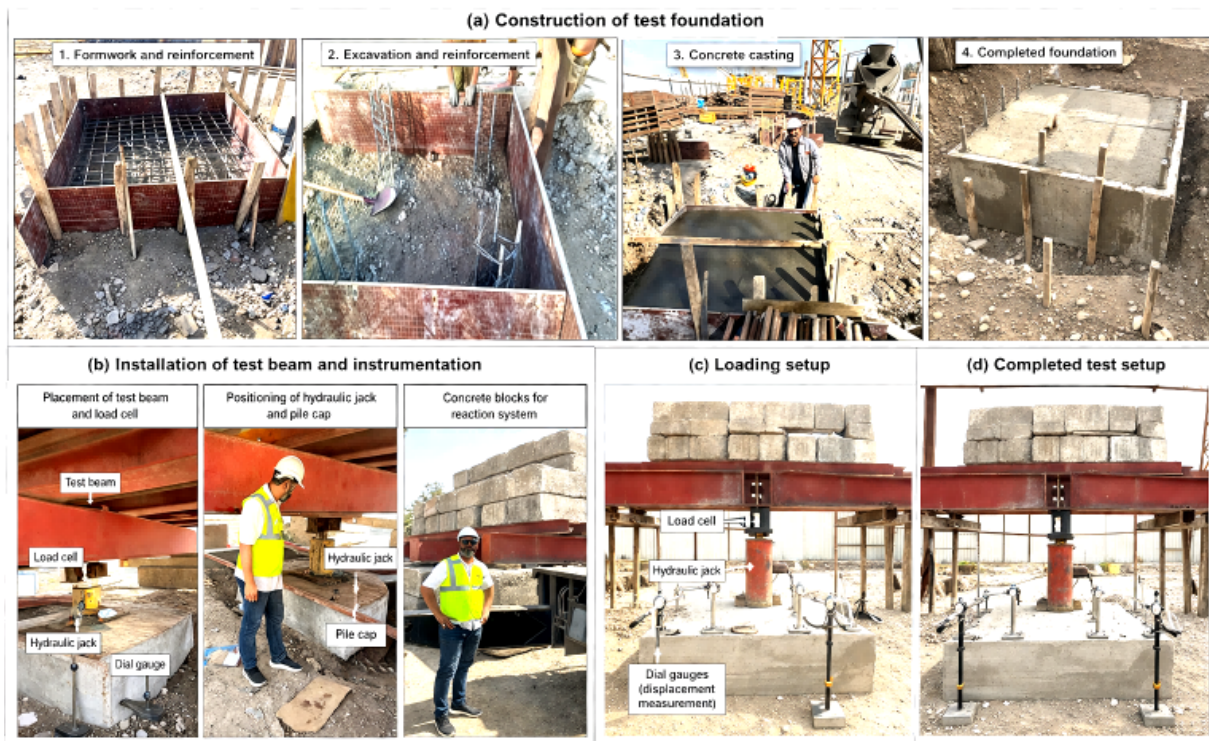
Experimental program: (a) Construction of reinforced concrete test foundation showing formwork, reinforcement, and casting stages; (b) Installation of test beam, hydraulic jack, load cell, and dial gauges for displacement measurement; (c) Loading setup with reaction system using concrete blocks; (d) Completed full-scale test arrangement for static load testing.
